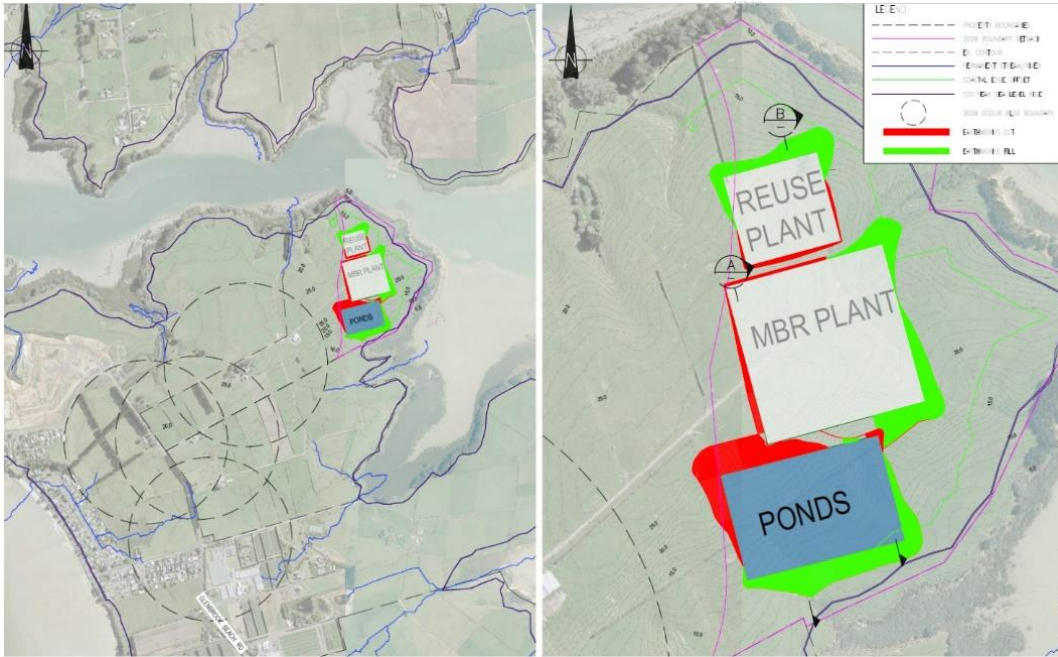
Site X indicative site layout (refer to Appendix D for more detailed plans). Dashed circles show 300m from existing residential dwelling.
